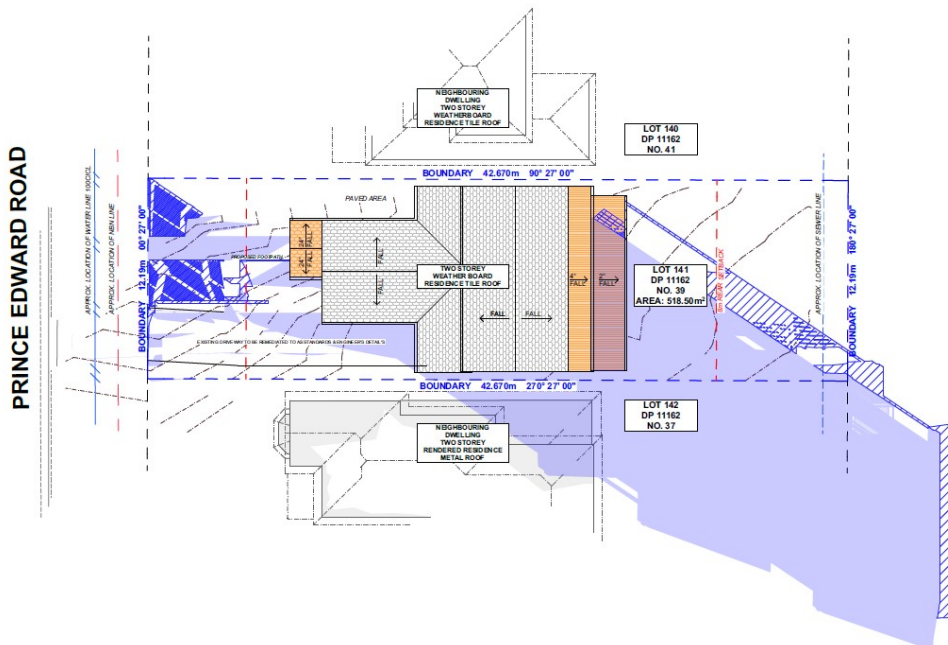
existing and proposed shadowing of 37 Prince Edward Road at 3pm June 21
